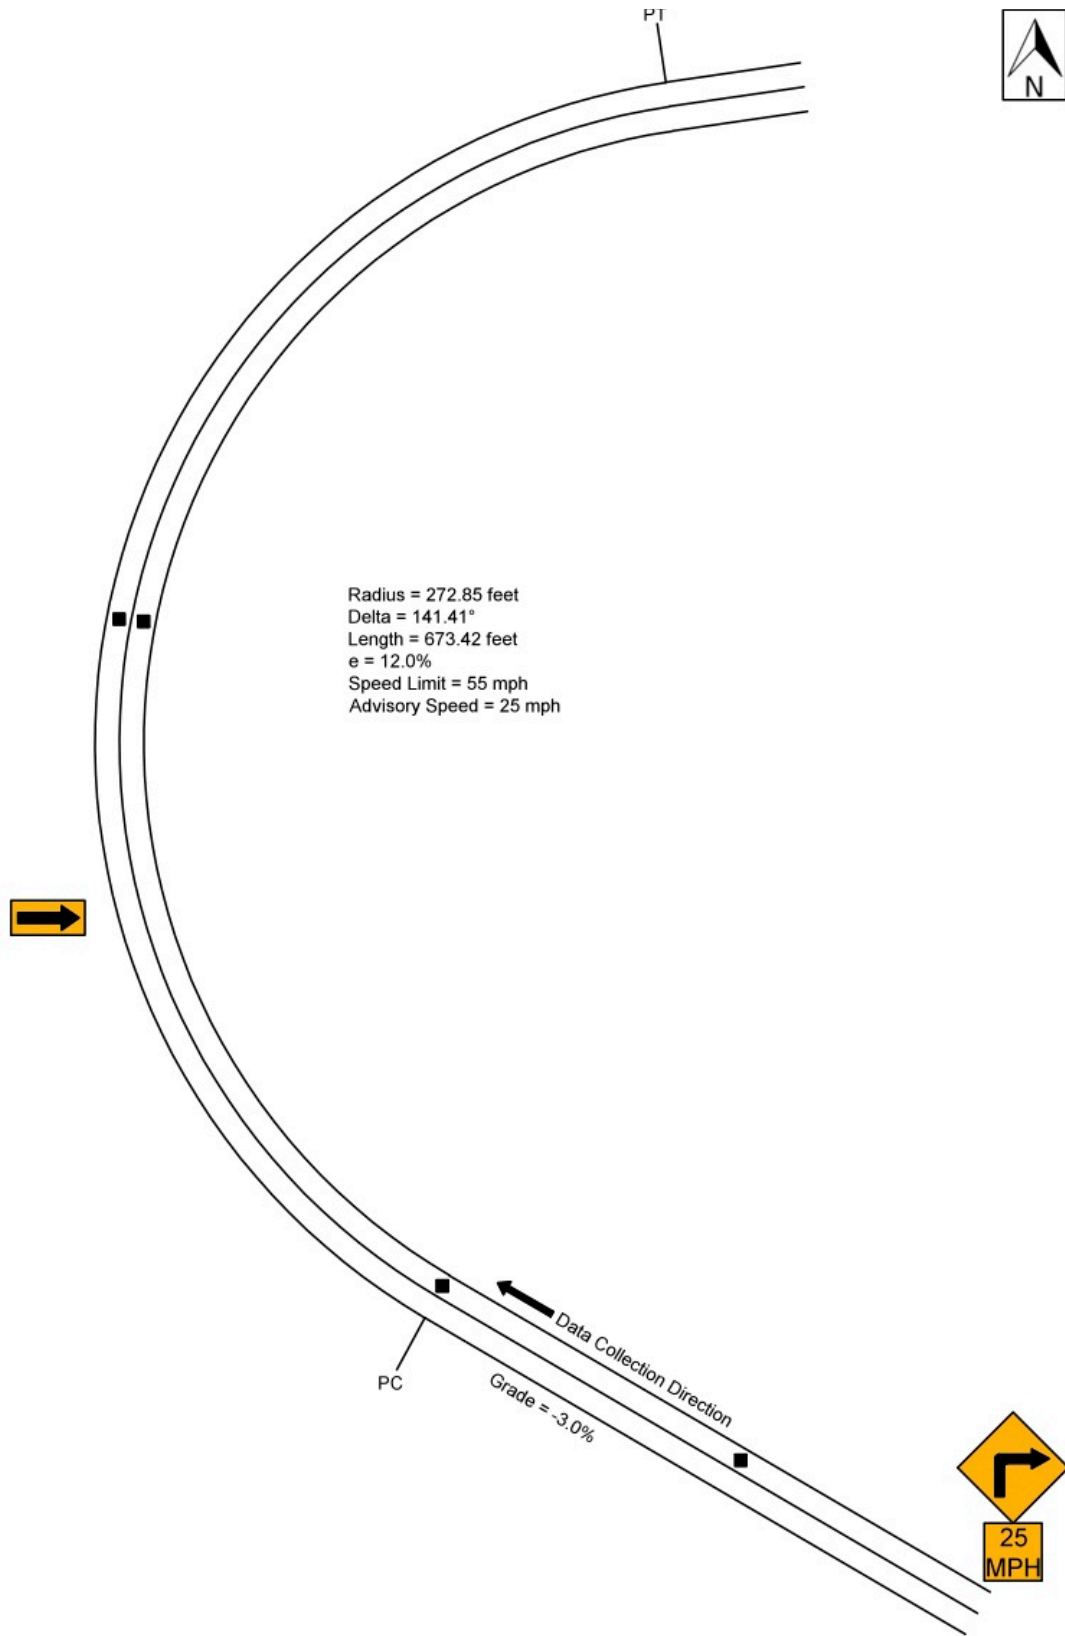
Diagram. Geometric layout of the U.S. Route 219 treatment B site (not to scale).
